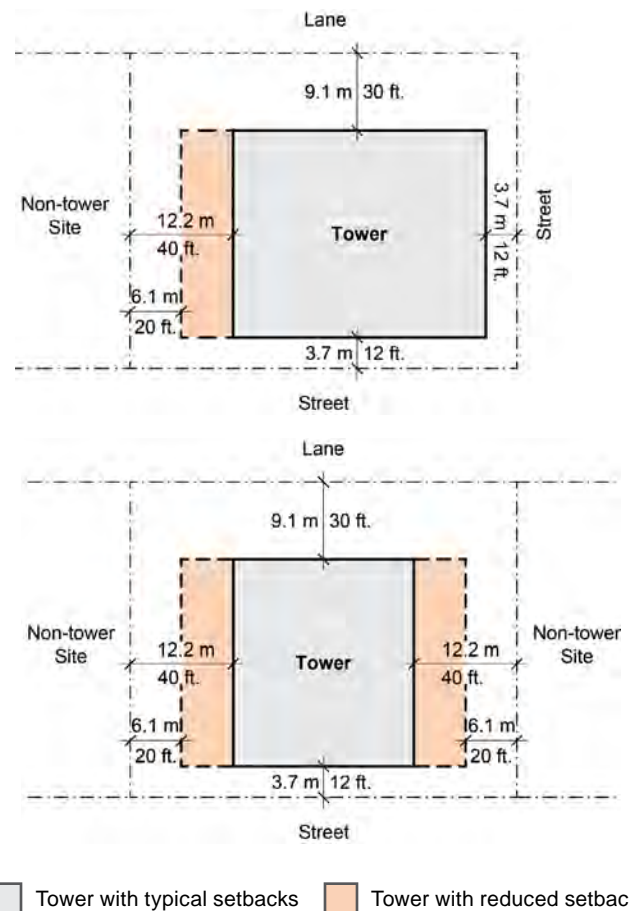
Plan diagrams illustrating tower setbacks and supported reductions on a corner site (top) and mid-block site (bottom).
